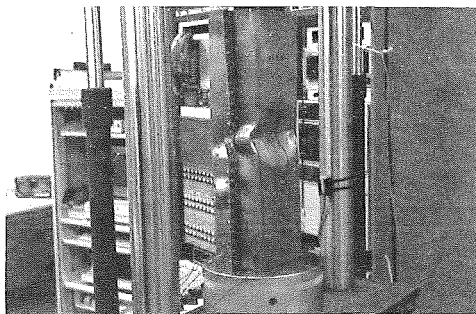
Failure of Box-Shaped Stub Columns (Specimen 1D3BX)
